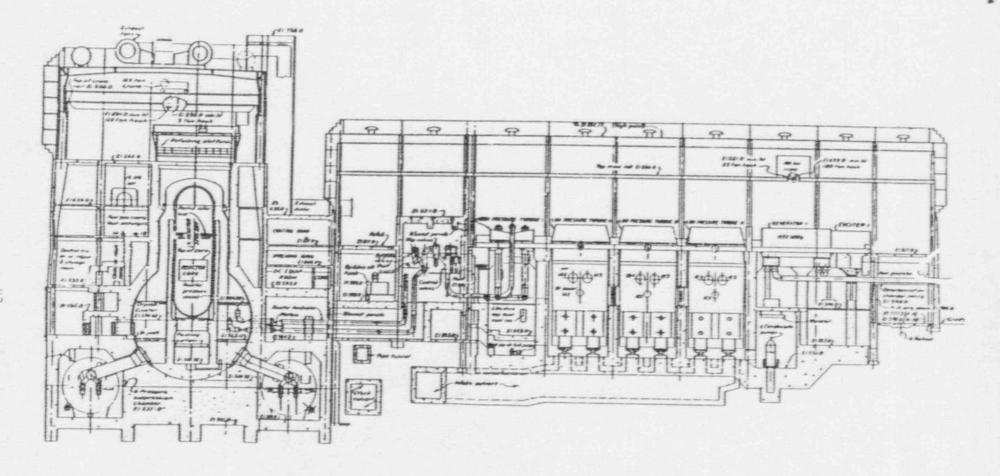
Typical Elevation View of Browns Ferry Reactor and Turbine Buildings
